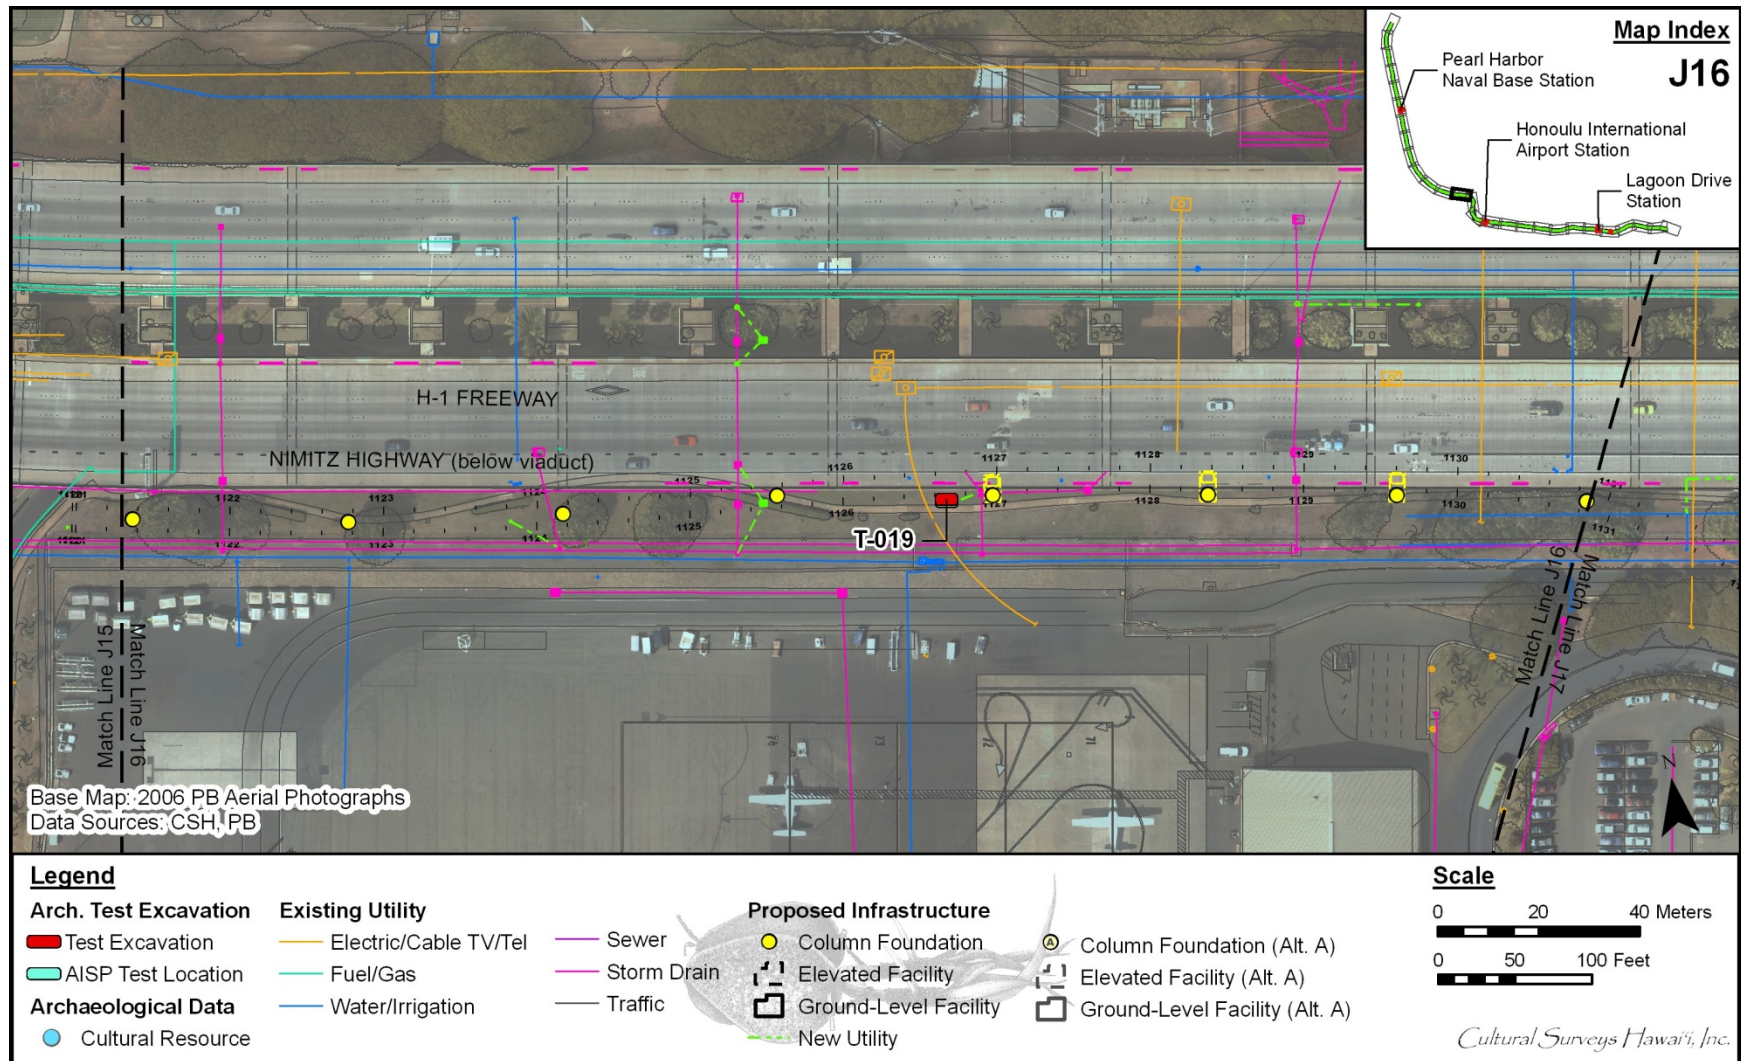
Map Sheet J16, one test excavation (T-019) at (*makai*) column foundation @ 1115+30
